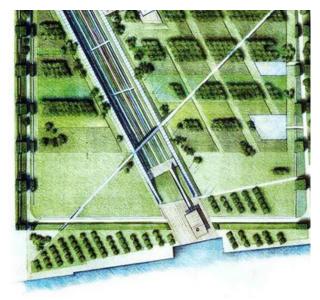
The Pavilion within the surrounding landscape (Taylor 2000)
